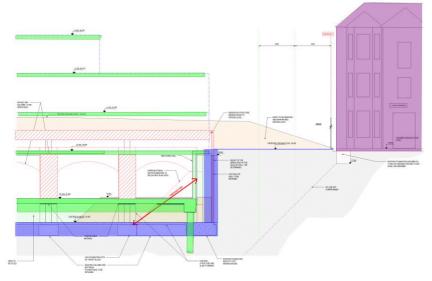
Plan showing proposed basement within existing in green. Extended basaement by 1.4m down in Red
